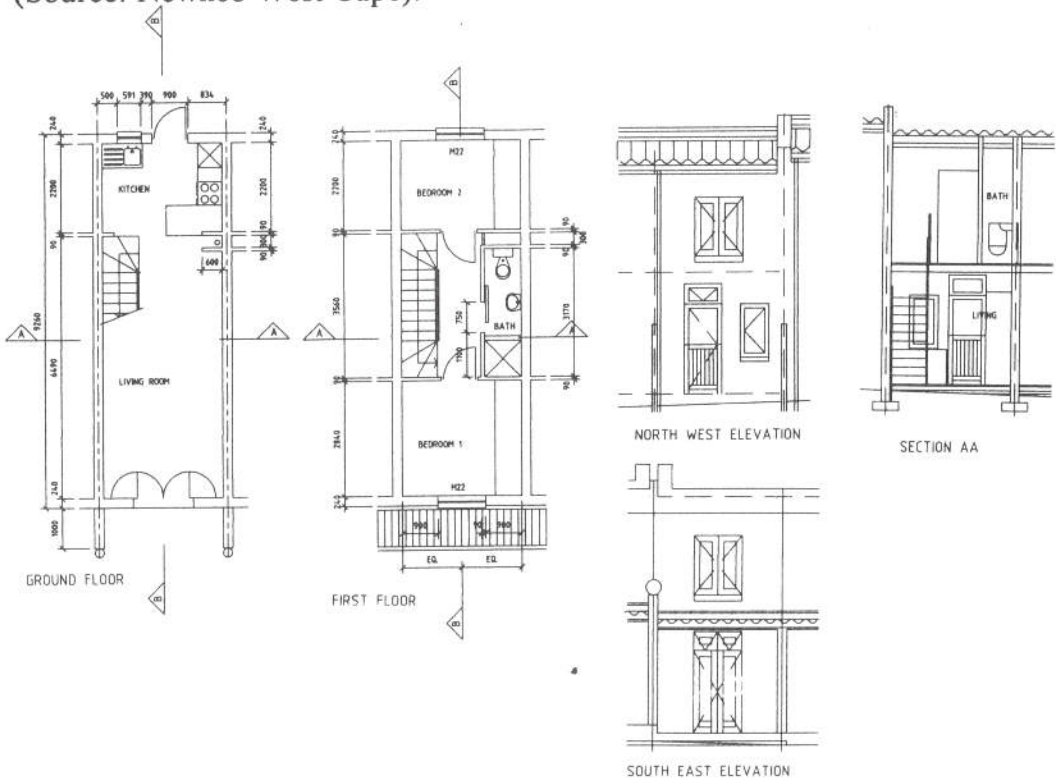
Dublin Street project. Woodstock, Cape Town. House type B. Plans, sections and elevations. (Source: Newhco West Cape).
